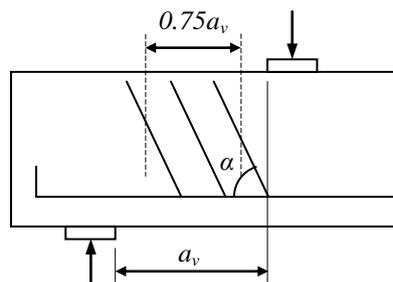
The contribution to the shear force from a load might be reduced, if this load is acting within a distance, a_v , from the support. The shear reinforcement should be placed centered between the edge of the support and edge of load application. The figure is based on SIS (2008).
